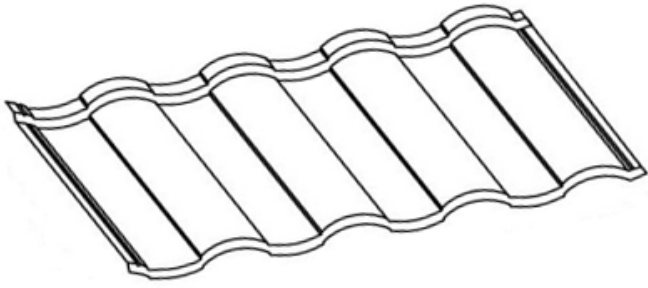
Unified Steel Stone Coated Roofing - BARREL-VAULT Tile panel
